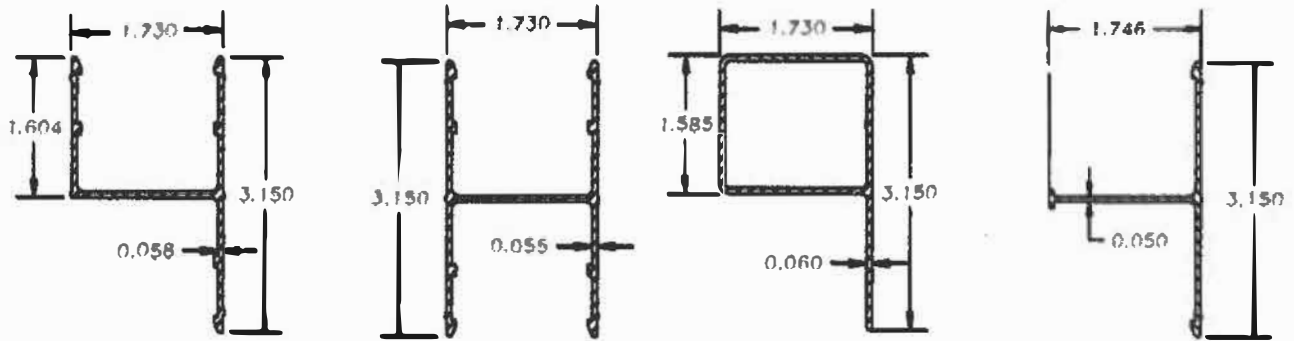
GUARDRAIL COMPONENT PROFILES
